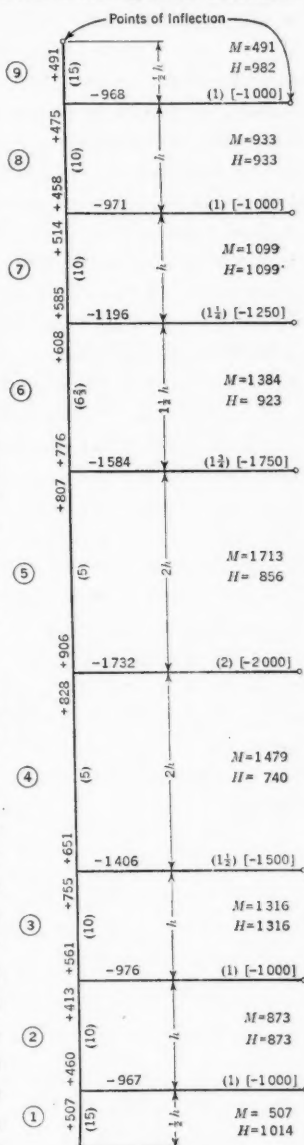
PART OF BENT, INCLUDING EXTERIOR COLUMN AND HALF OF ADJOINING BEAM.
